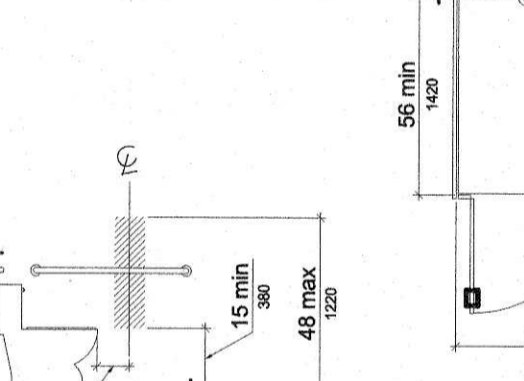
Rear Wall Grab Bar at Water Closets
